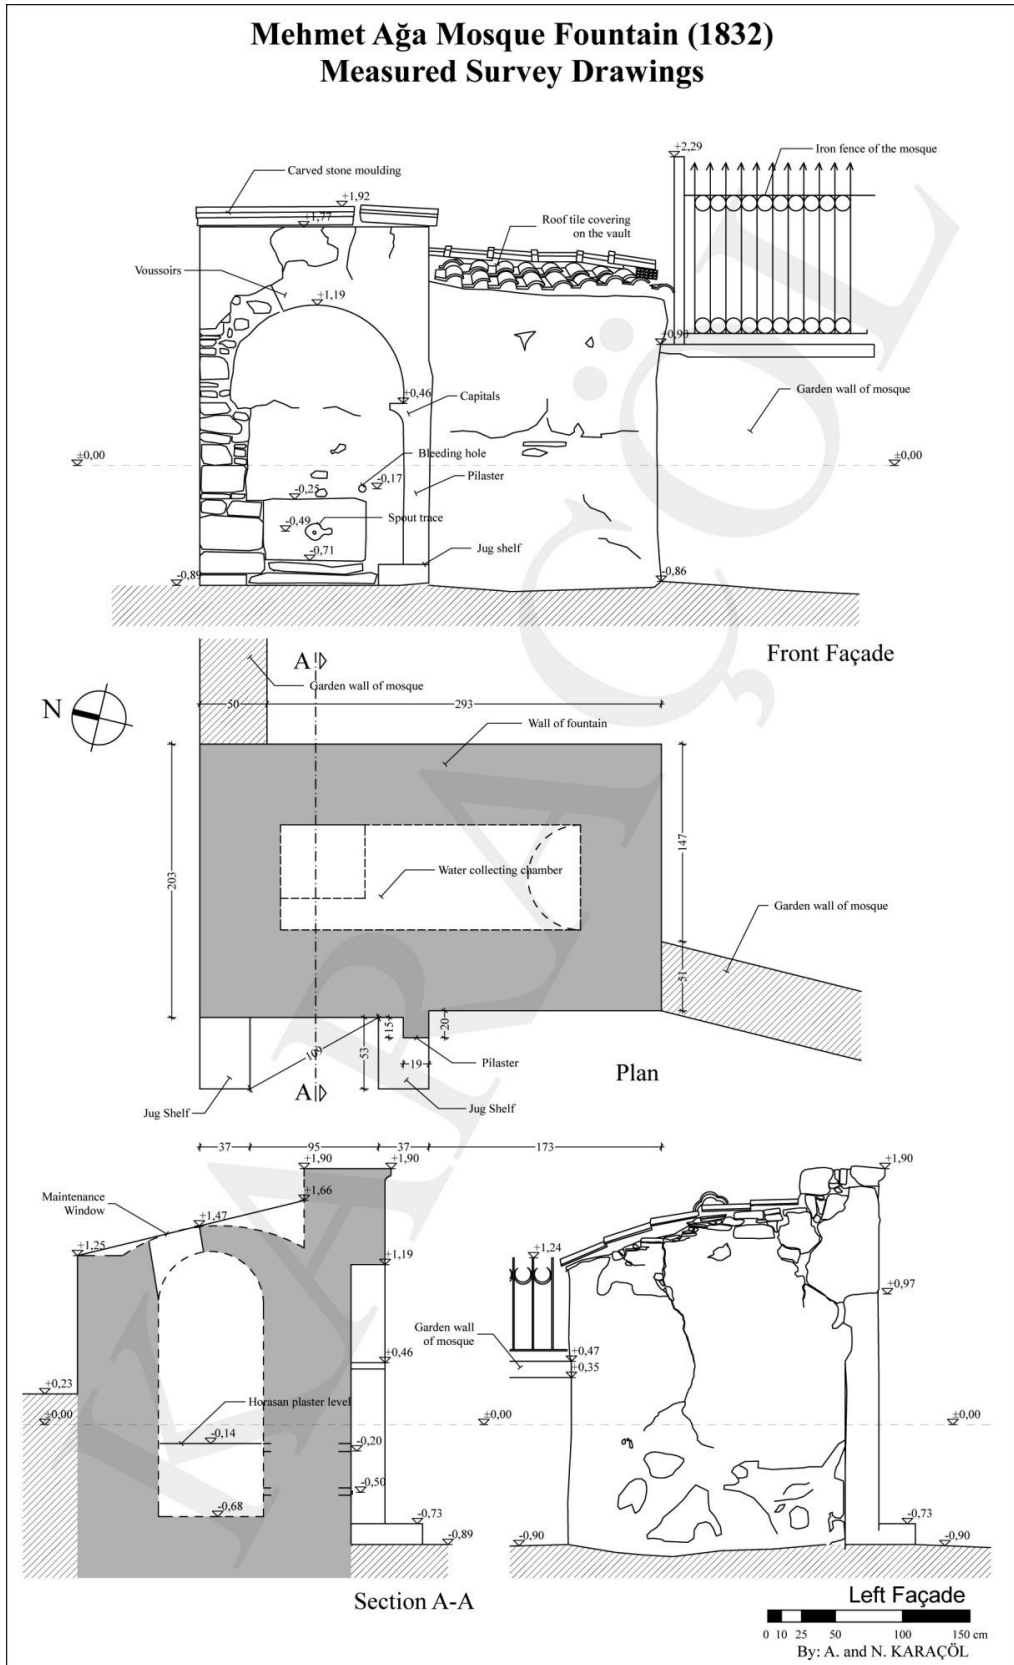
Hacı Mehmet Ağa Mosque Fountain front façade, plan, section and left façade drawings
